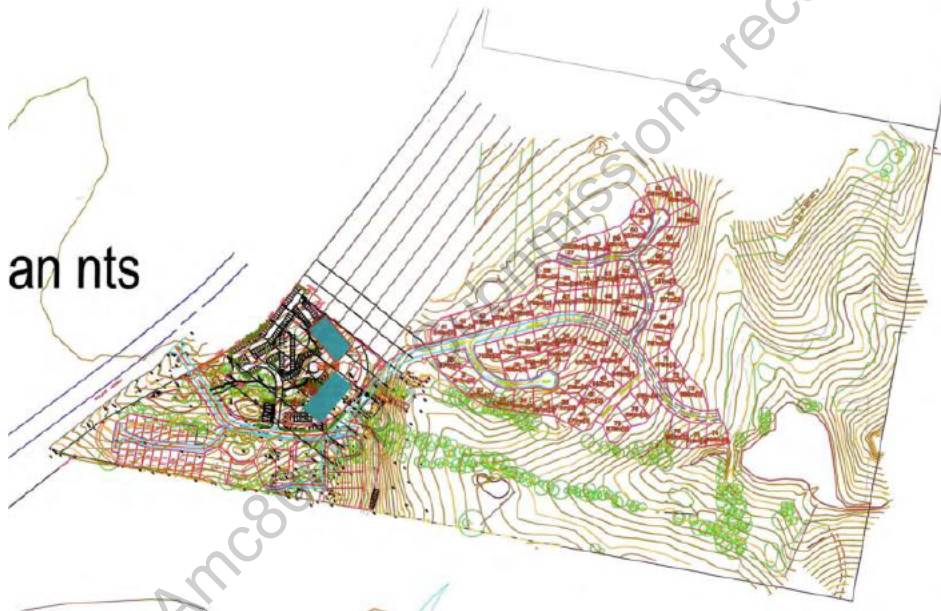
Extract from plans endorsed under Planning Permit 2013/7362
